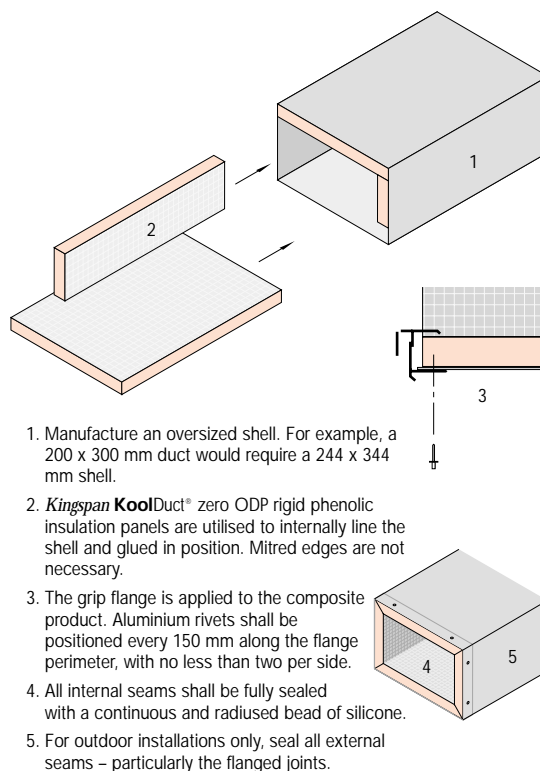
Aluminium Clad KoolDuct[®] zero ODP
